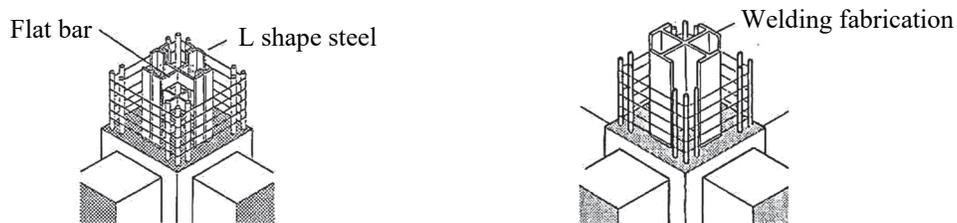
non-full web steel frame (grid-shaped) and full web steel frame
